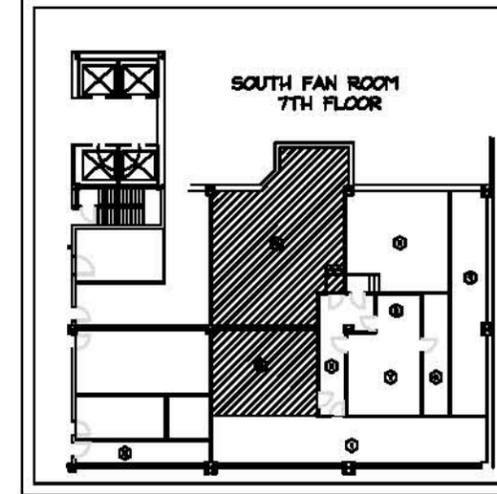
REMOVE 8"SF and replace with full wall SP. ABATE/REMOVE accessible ACMFP and SF. ABATE north side of beam by removing replacing gypsum wall board on partition wall.
